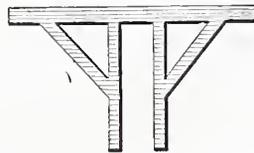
Bracket Bearing, the Use of which is shown in the Previous Illustration.
